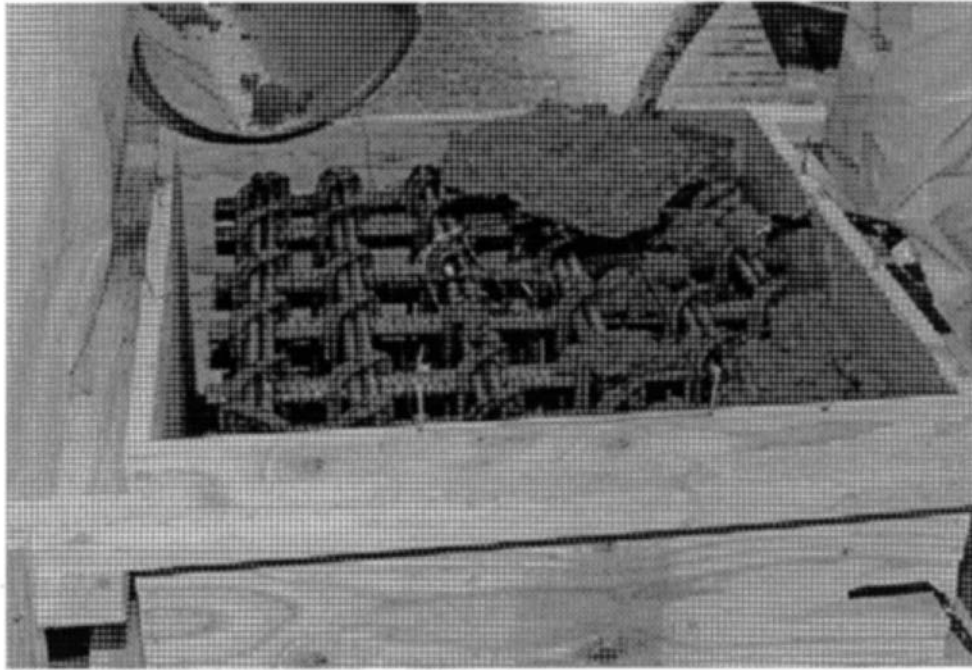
Wooden formwork used to contain the 6000-psi concrete that surrounded the steel reinforcing cage. Concrete was placed carefully by hand to protect the delicate concrete embedment strain gages from damage during the pour.
